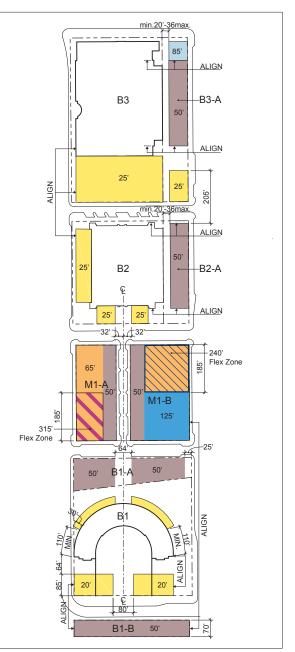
t: Detail Height Plan - Blocks B1, M1, B2, and B3
